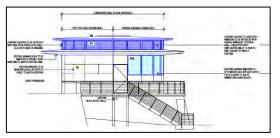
Approved east elevation of Lifeguard Tower, Tunnel 2 and Amenities block.
